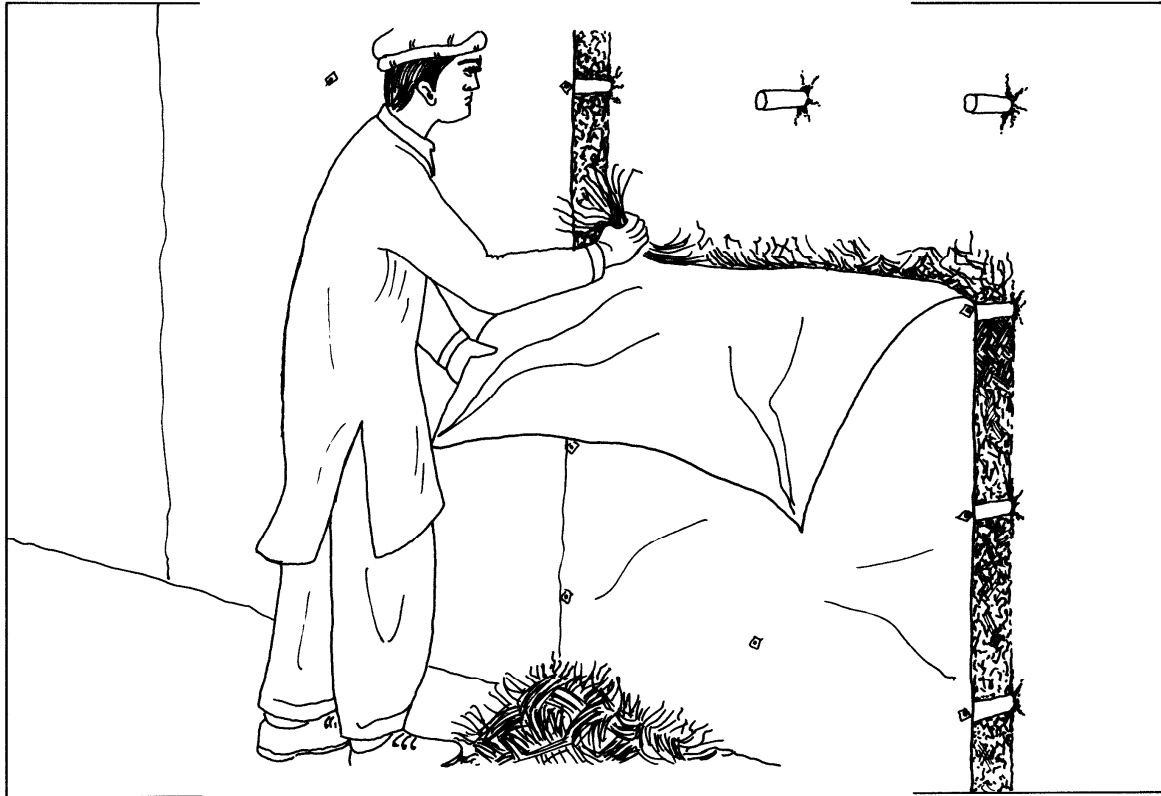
ALL CAVITIES ONE INCH OR LARGER TO BE FILLED WITH STRAW IN BAGS AND ADDED LIME.
